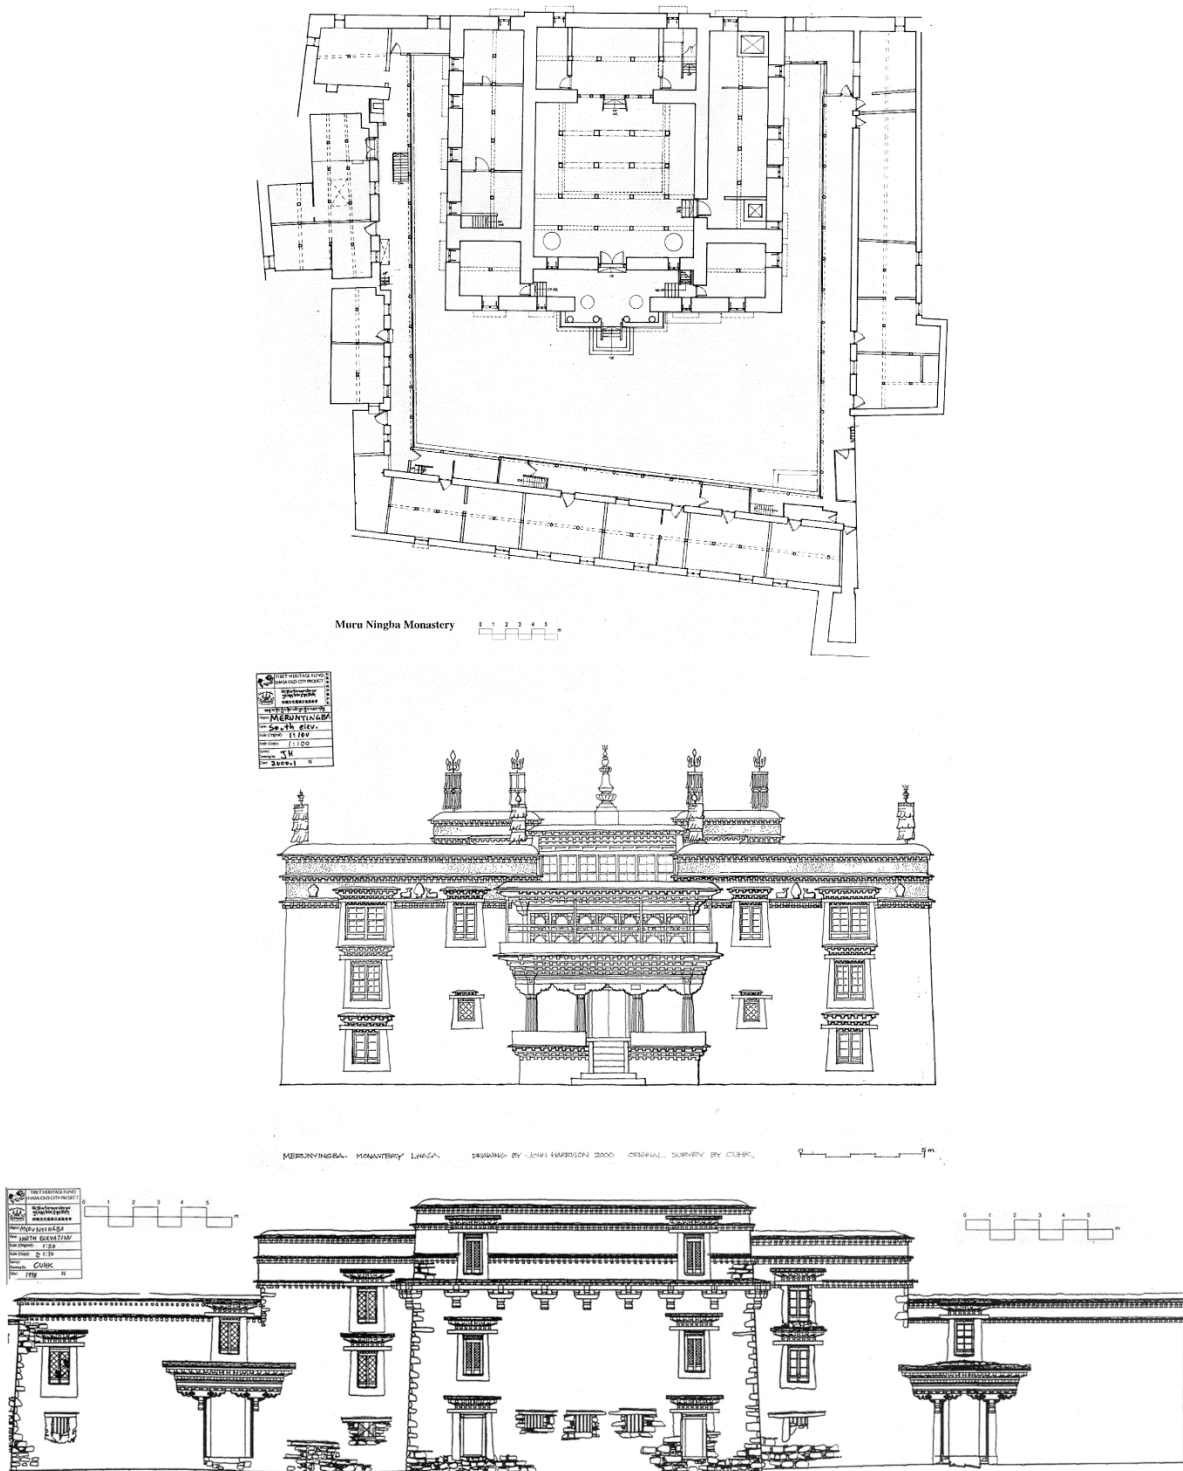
John Harrison. “Architectural Drawings of Meru Nyingba Monastery Showing the Plan, South Elevation and North Elevation.”
